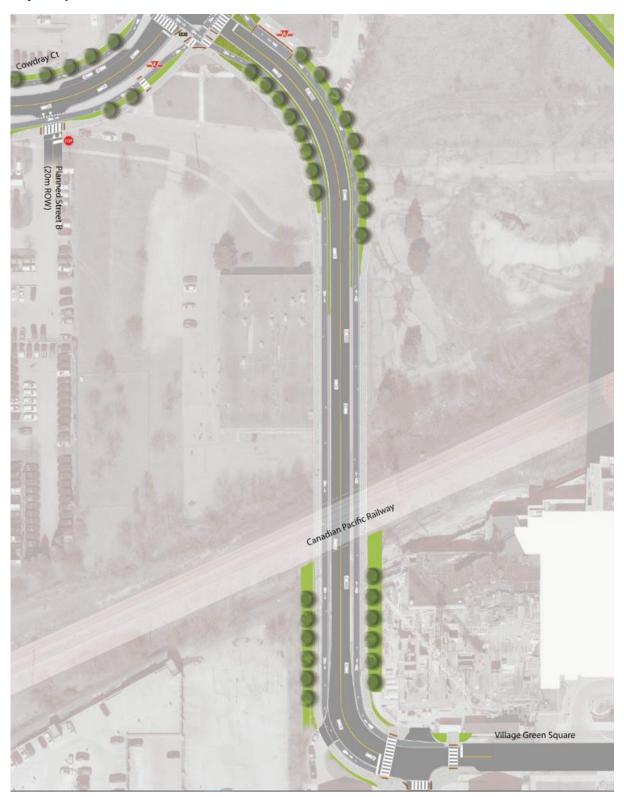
Rendered Plan of New Complete Street (Collingwood Street to Cowdray Court)
